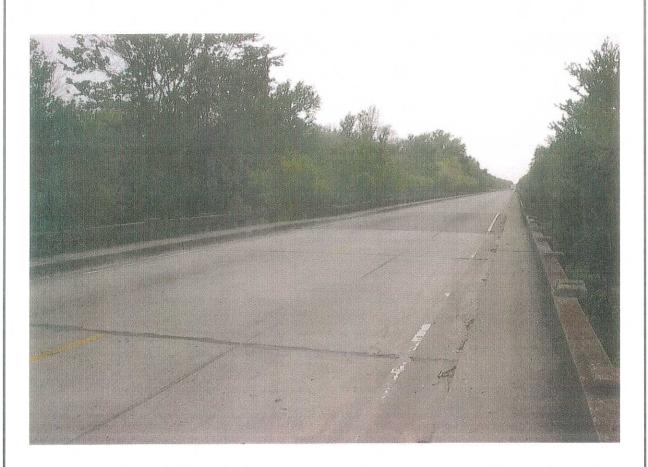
View of sag in bridge deck looking south on PeeDee Overflow bridge.
